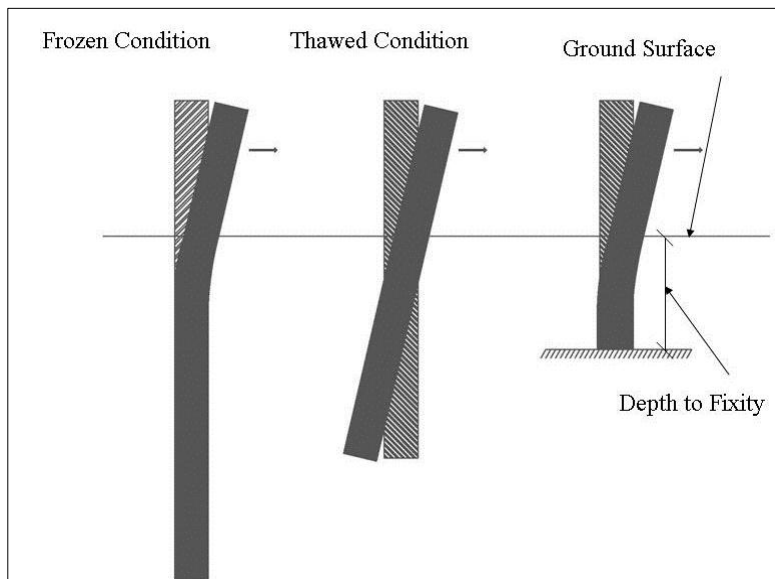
Pile short and long foundation behavior and depth of fixity.
